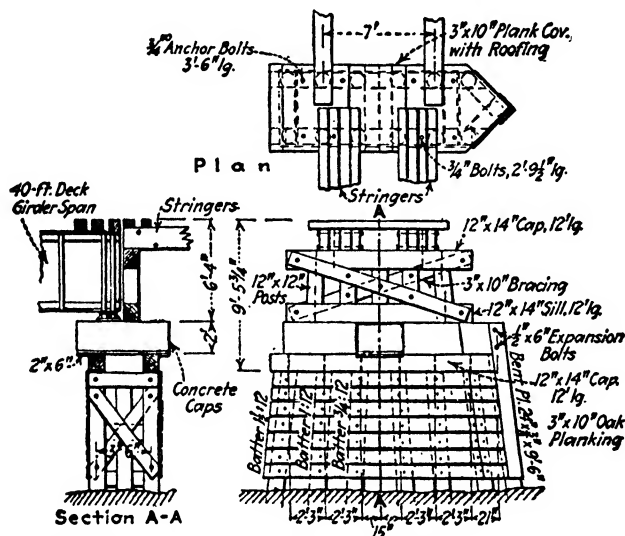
Timber Pile Pier for Bridge over Platte River.
